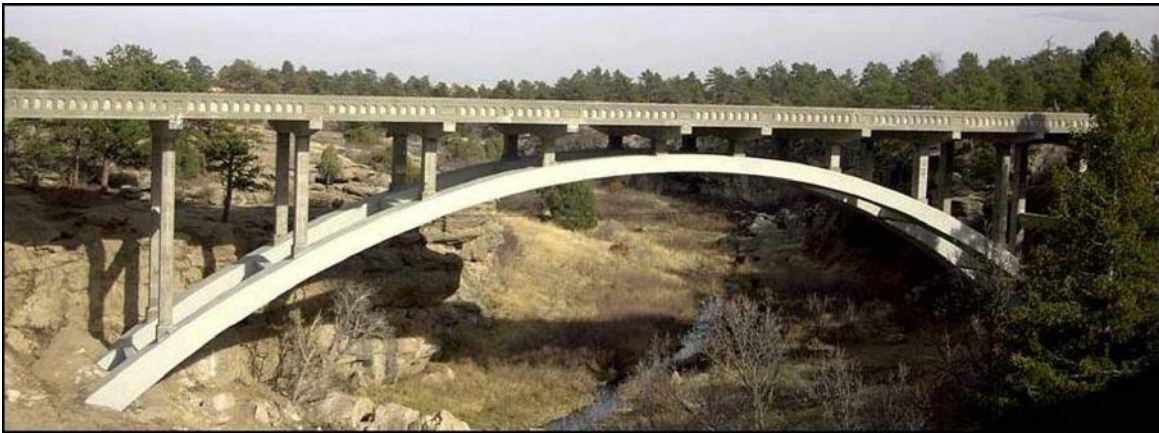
Repaired Castlewood Canyon Bridge, Franktown, Colorado
